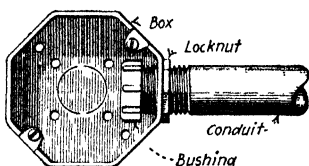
Conduit cut too long; improper connection between conduit and box (see Fig. 309).
